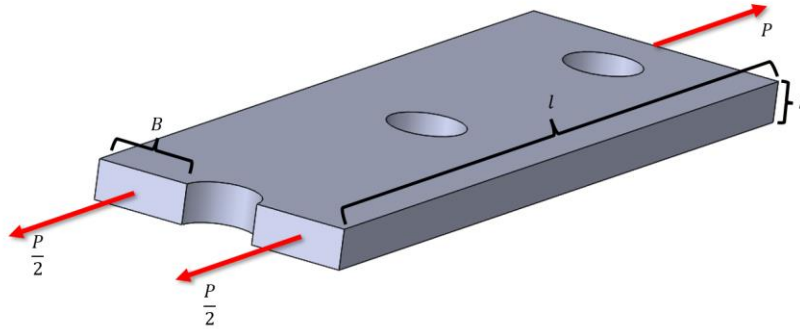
Failure in gusset plate due to pure tension.
